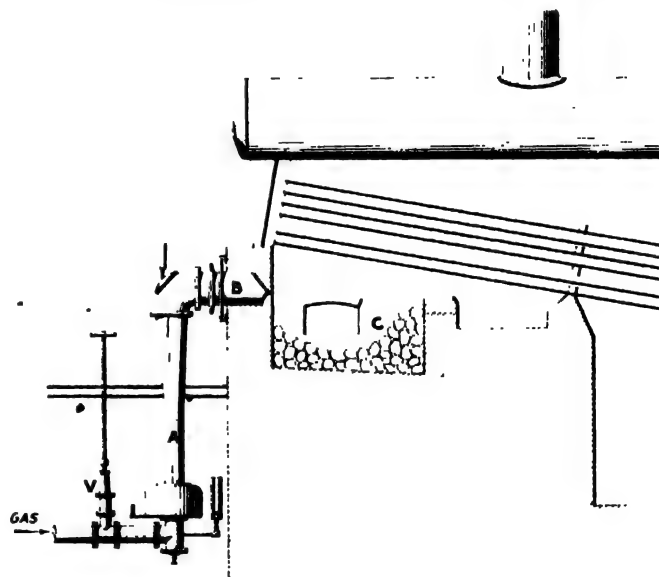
LONGITUDINAL SECTION OF BOILER WITH GAS BURNER
